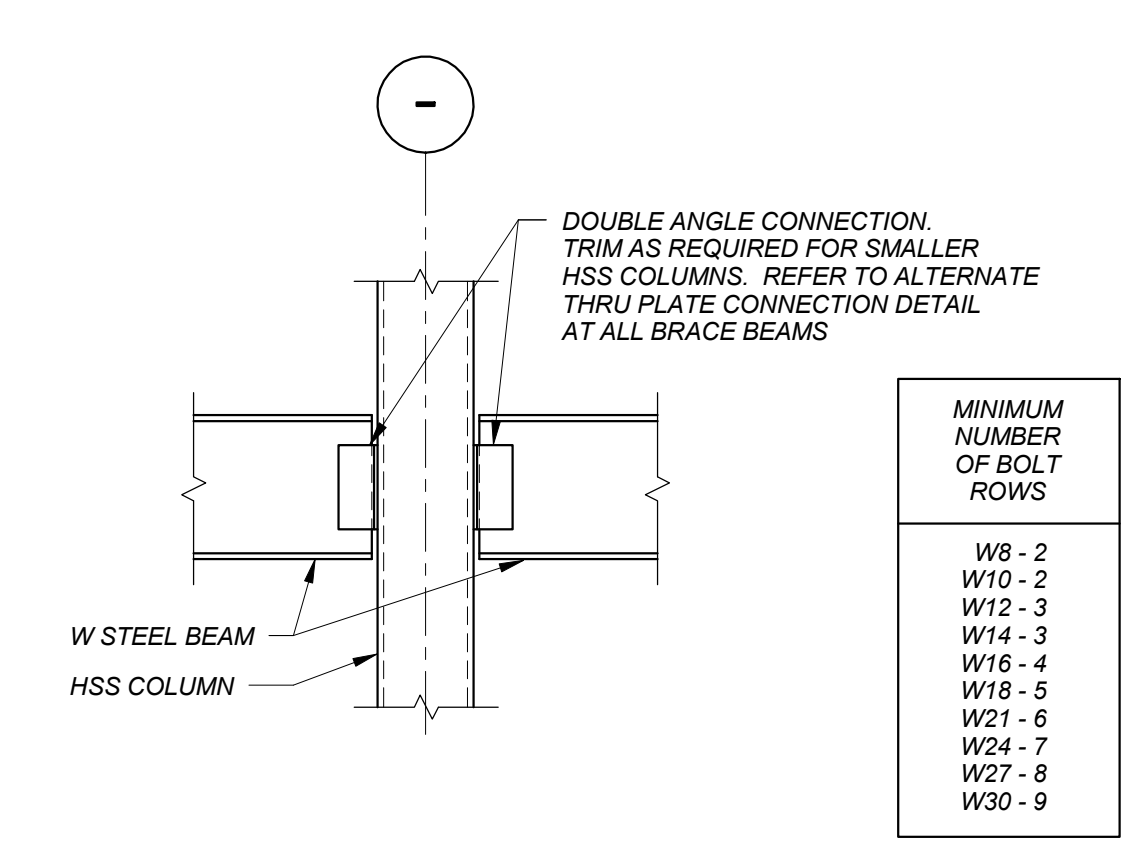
DETAIL SIMILAR AT SAME SIZE COLUMN SPLICE
